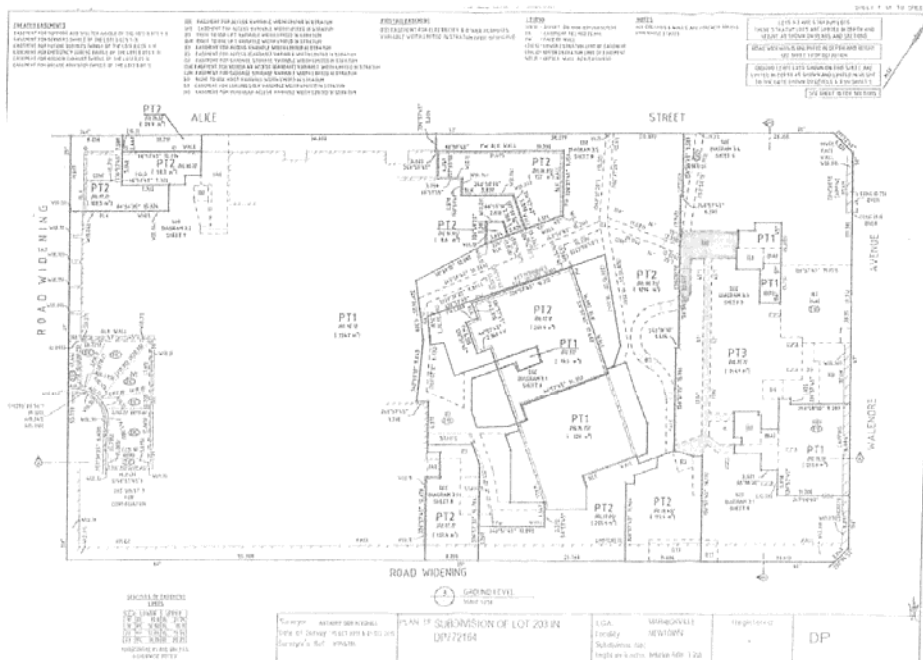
Extract from Deposited Plan showing ground level easements for access labelled (A) (coloured orange) and (C) (coloured yellow) allowing common pedestrian access through the site
